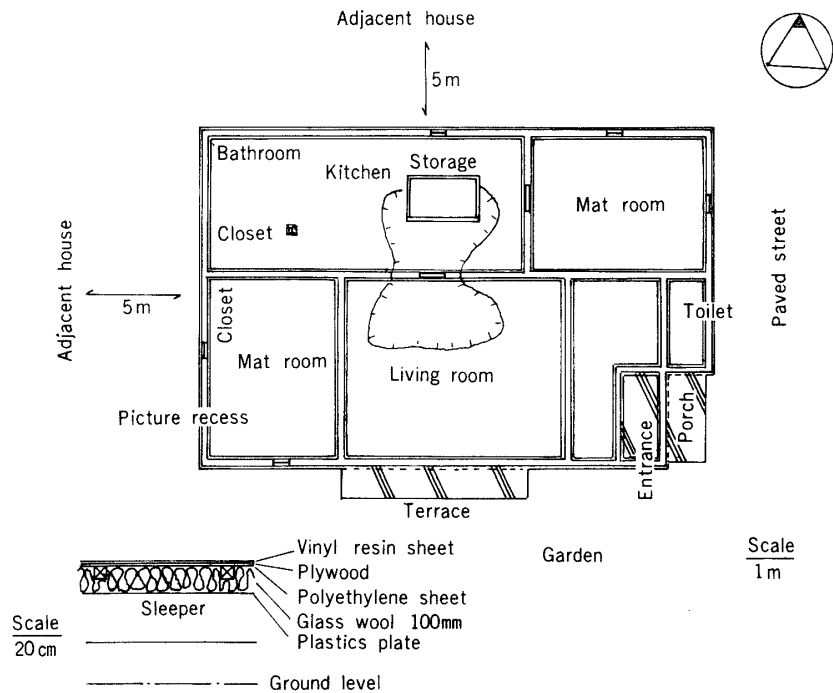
The foundation plan and the details of the floor constitution (Case 3).
